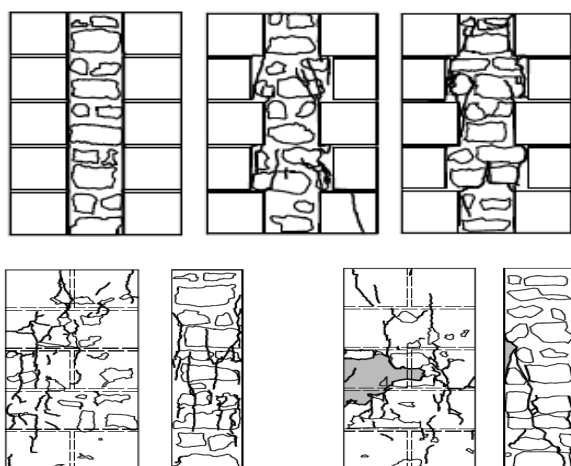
typical failure mode of three- leaf masonry in compression.
